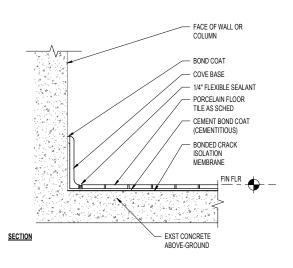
DETAIL PORCELAIN TILE FLOORING (SLOPE)
